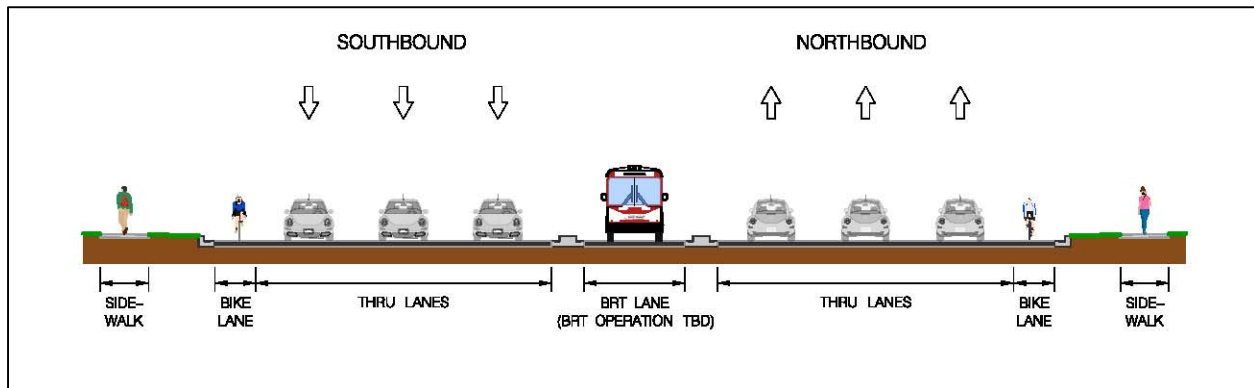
Alternative 3C - Section 2: Rockville / White Flint
